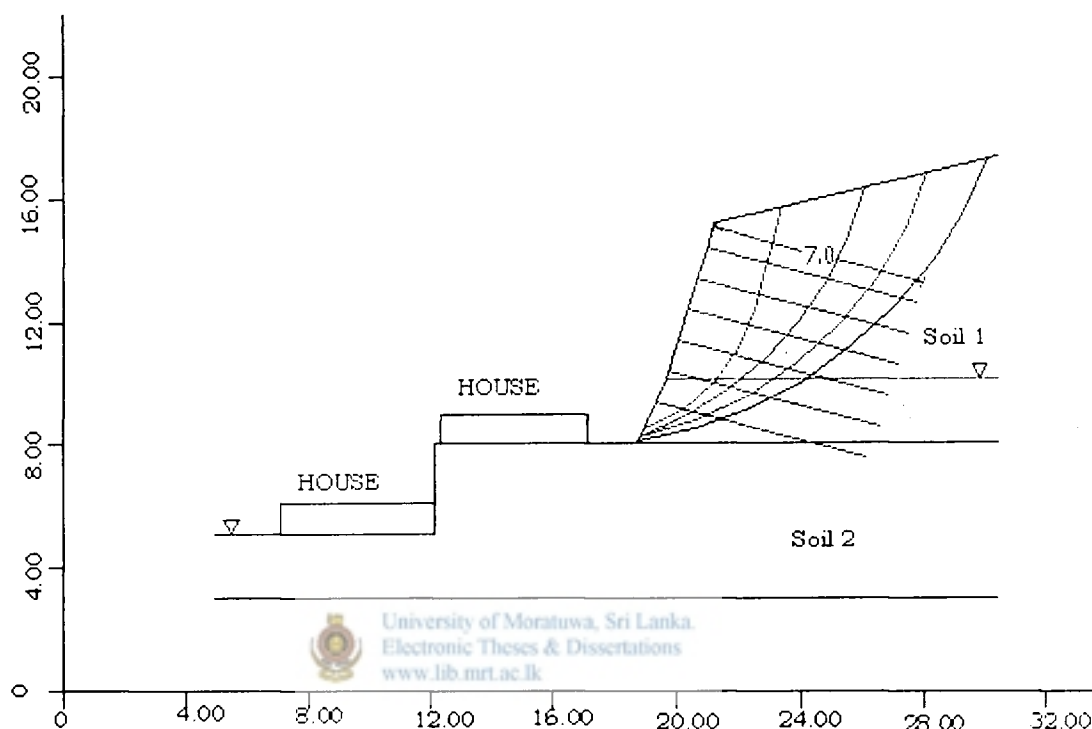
Proposed nail arrangement and the failure surfaces considered for cut slope 1
